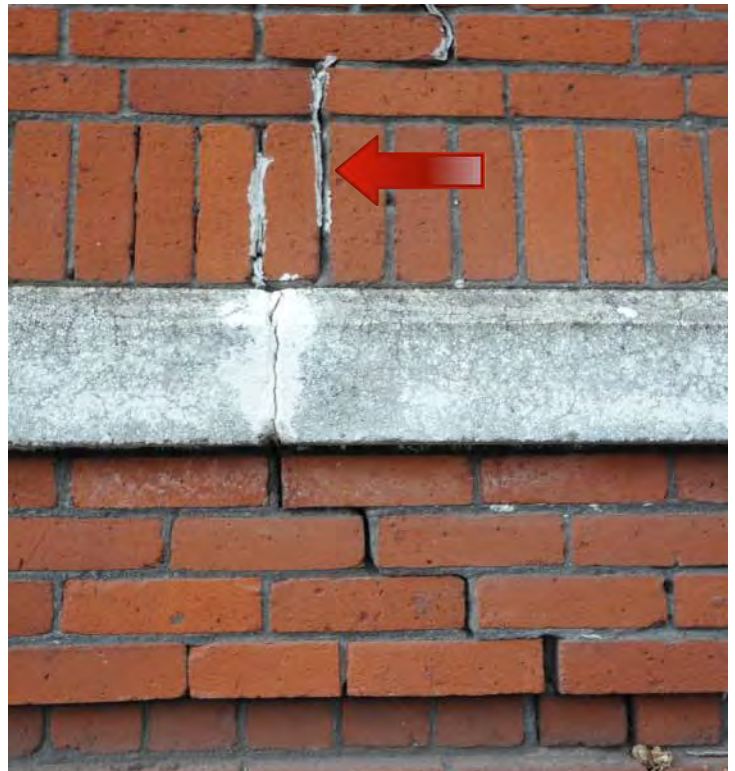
Detail at cracks and failed sealant repairs, north elevation.
